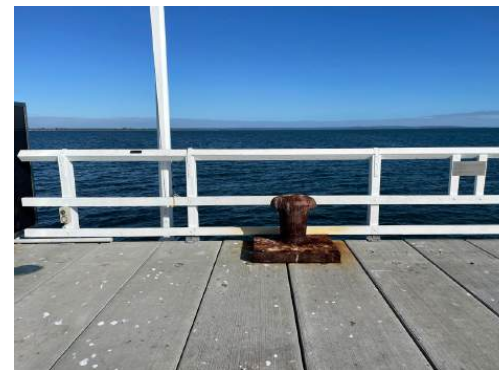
View of salvaged bollard located at Jetty Head. H+H Architects, 2022.
